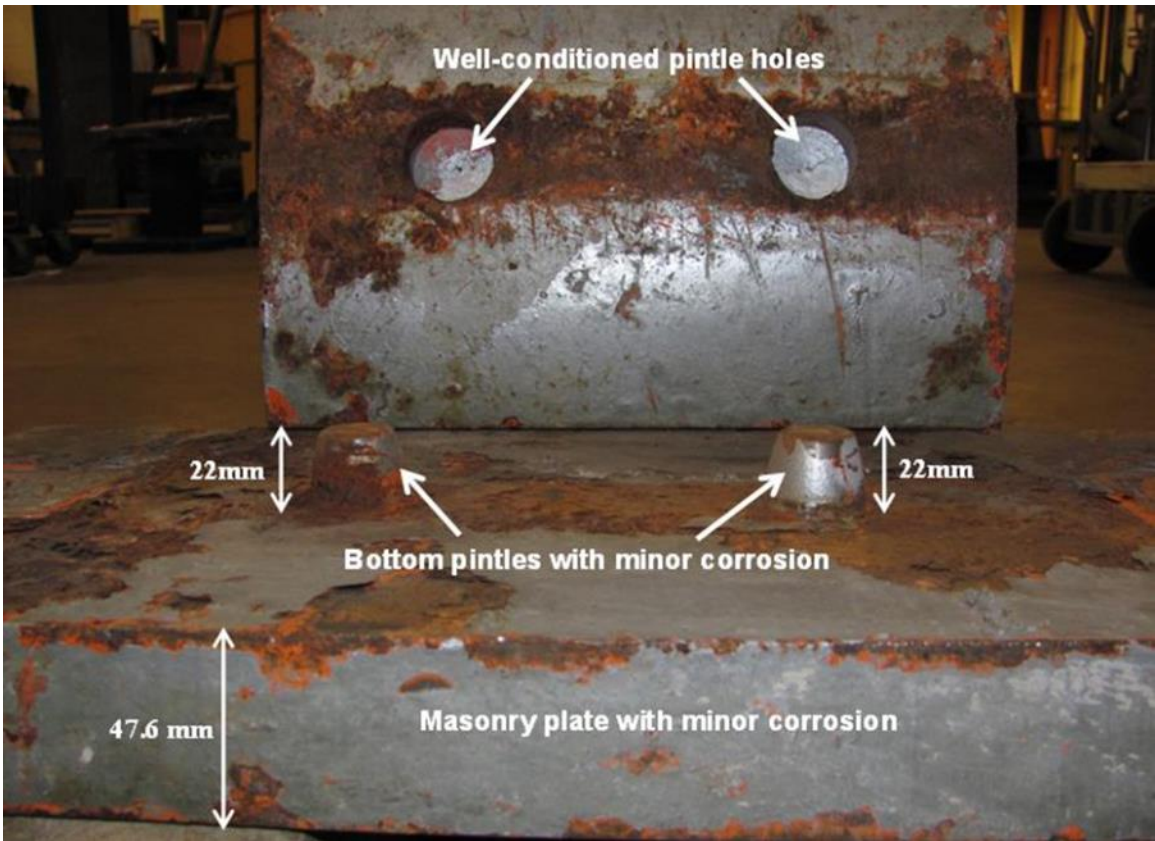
Bottom contact interface of Bearing PR18 in the as-received condition
